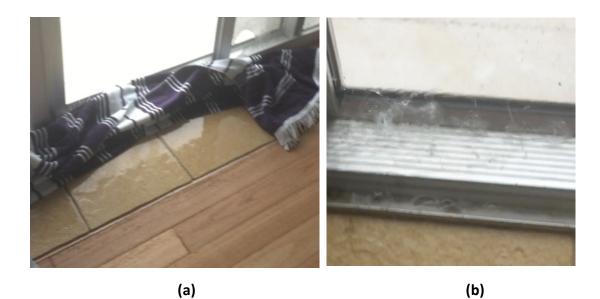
(a) Towels placed in front of large windward wall windows to control large amounts of water, and (b) water spaying into living room from under the door (CTS TR63)
